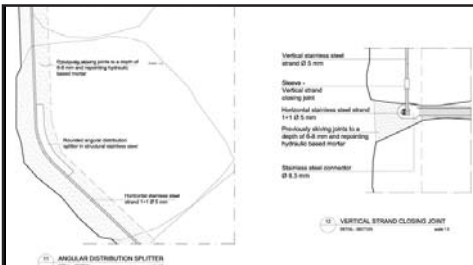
Light joints reporting to create a regular laying bed for steels strands. Placement of steel strands according to designer's layout and connection to the connector's hook
